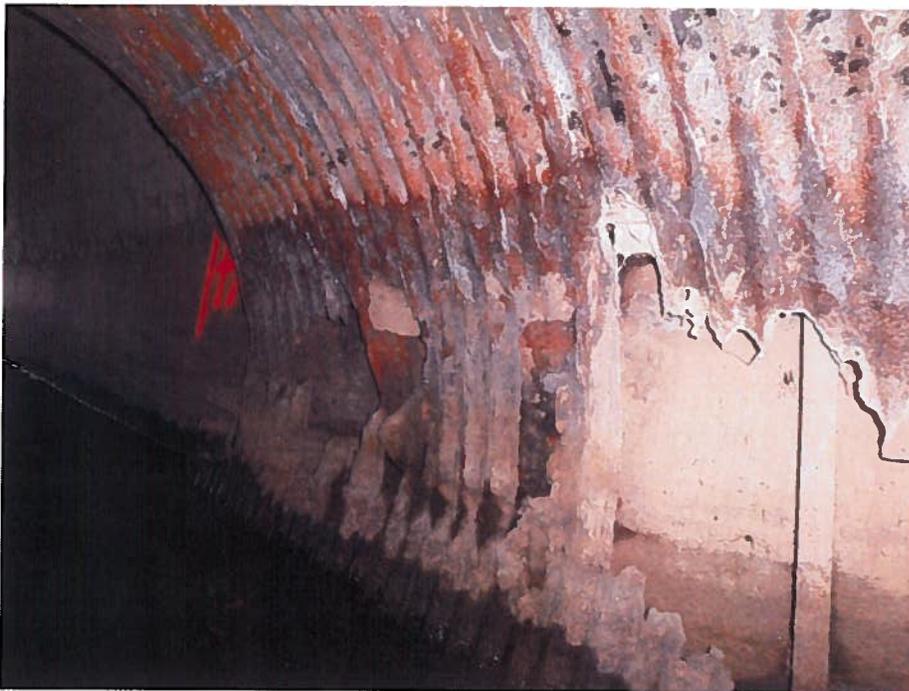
Sta. 1+70 to sta. 1+77 East wall, transition from manhole no. 2 to C.I.P. arch
